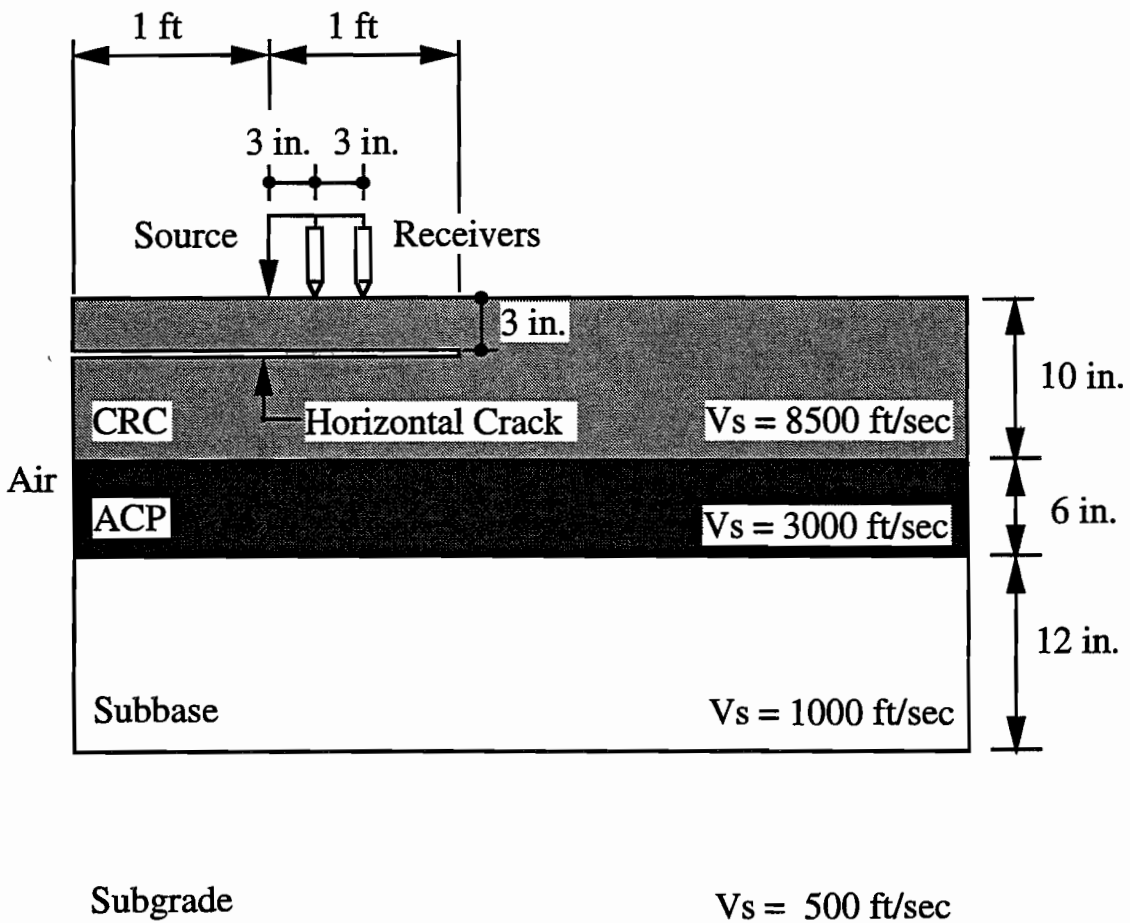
Simulation of Testing near the Pavement Edge with a Horizontal Crack Extending to the Pavement Edge
